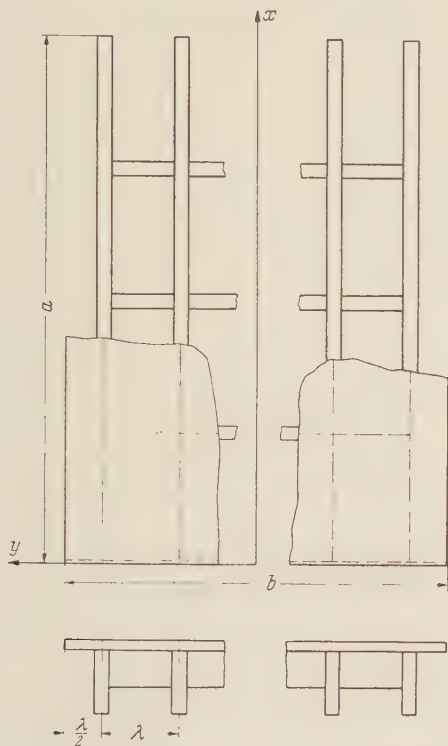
Beam Bridge Considered as Orthotropic Plate.
